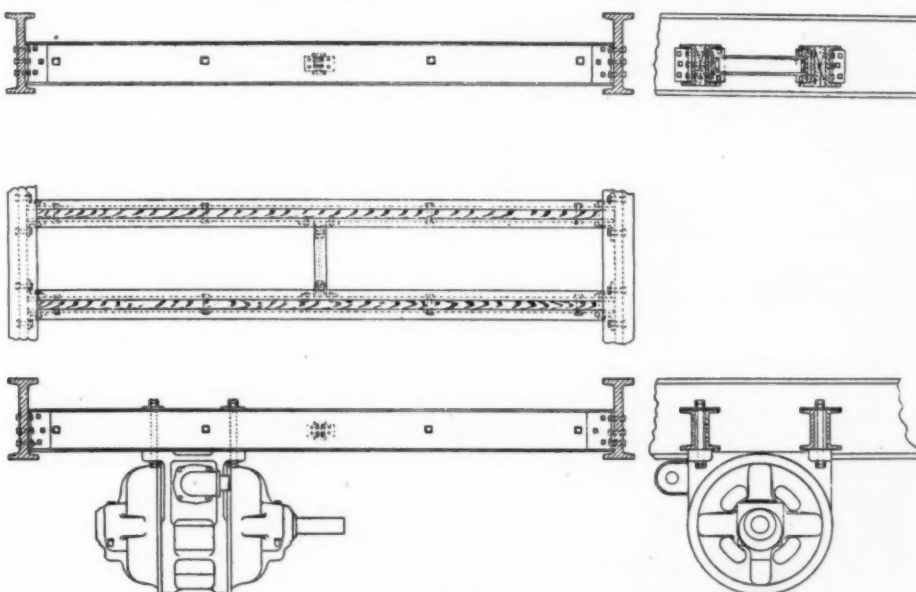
Mounting Motor on Ceiling Using Structural Steel
